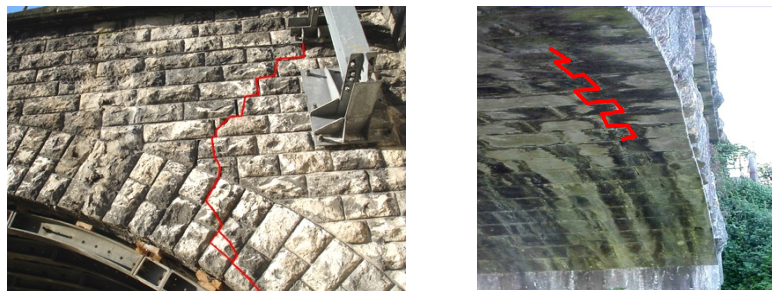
Transversal crack in a spandrel wall (left) and longitudinal crack in the intrados (right)
